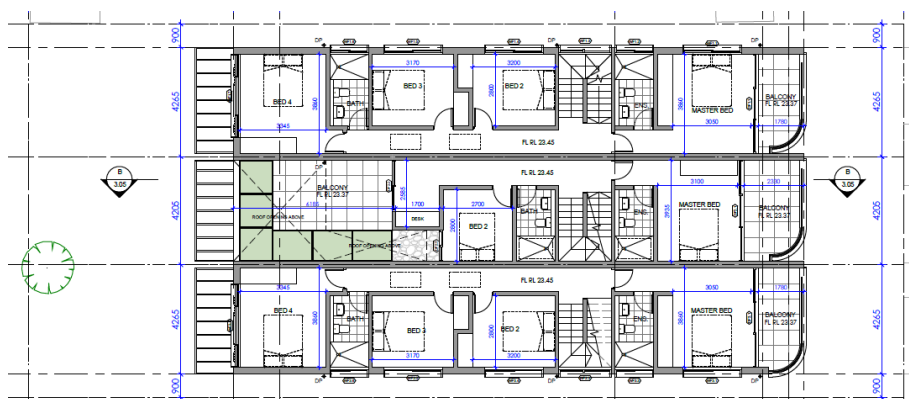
Initially proposed 1st floor plan (Source: Bryan Long Group)
